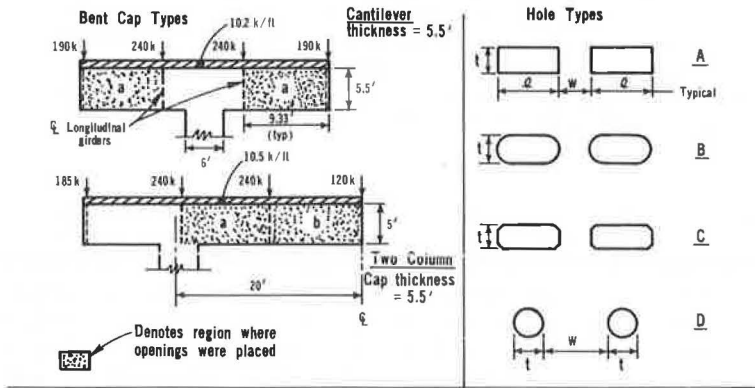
Cross section and dimensions of cantilever and two-column box girder highway bridge.
